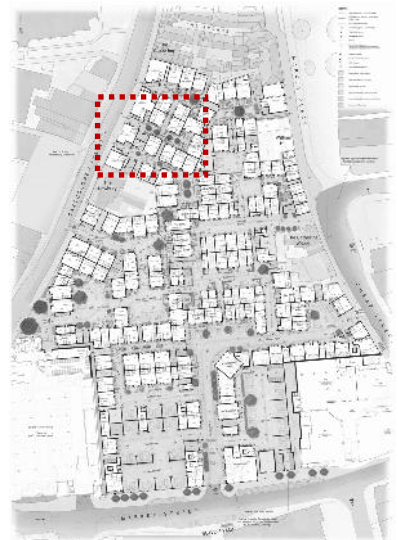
Ground Floor Layout of Artist's Mews (South).
